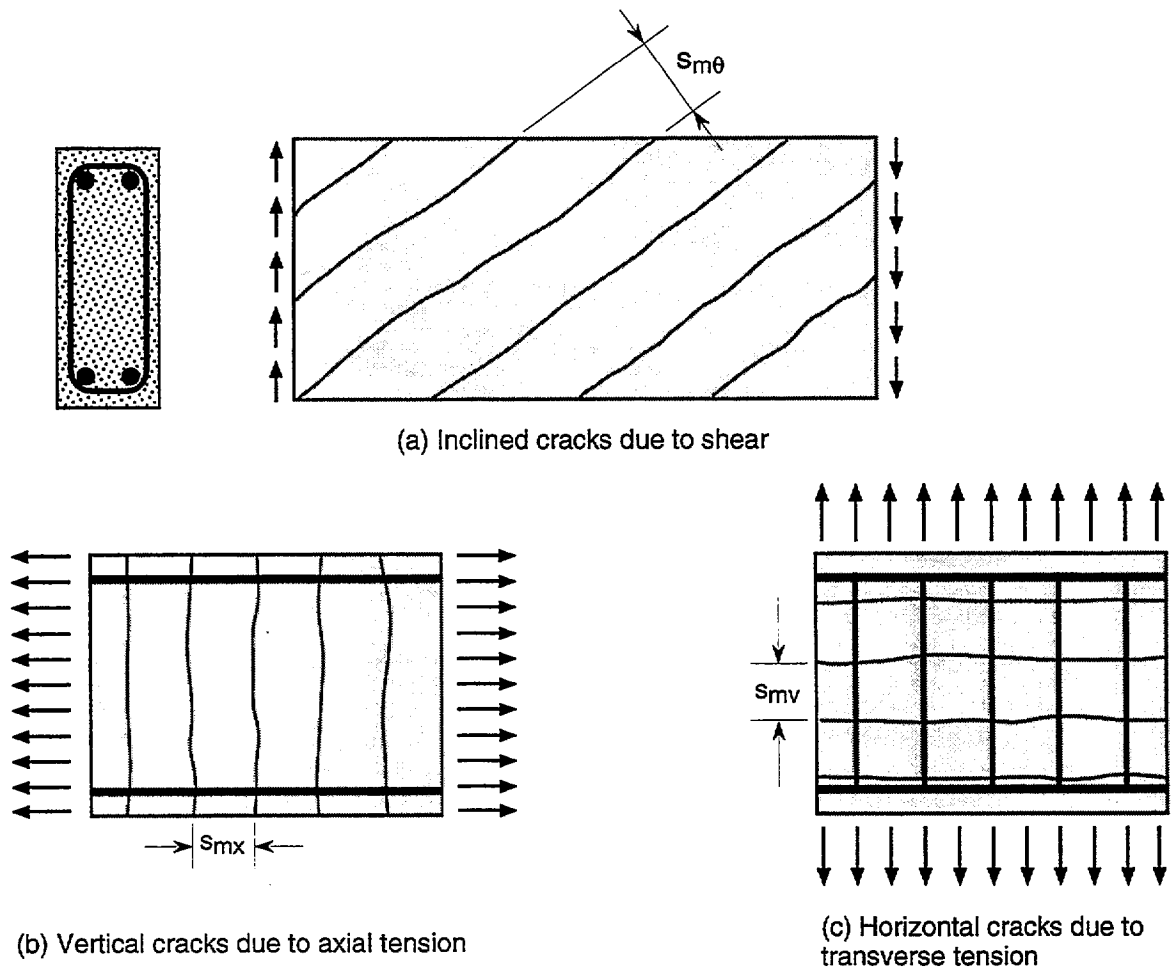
Crack spacings in reinforced concrete (Collins and Mitchell 1991).
